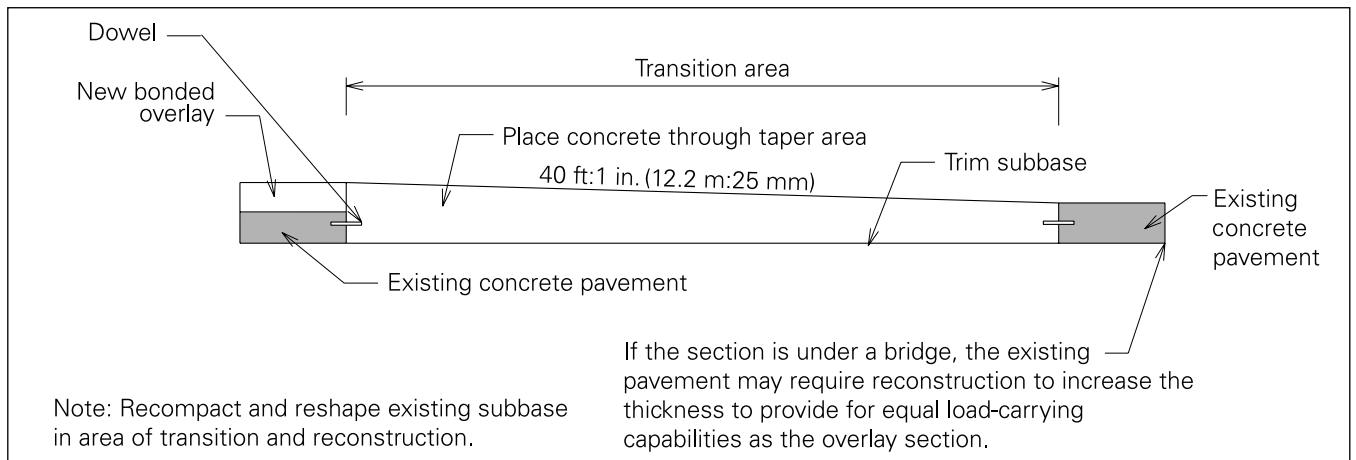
New transition tapers used to meet bridge approach slabs or maintain clearance under bridges with bonded overlay of concrete pavement (adapted from ACPA [1990])
